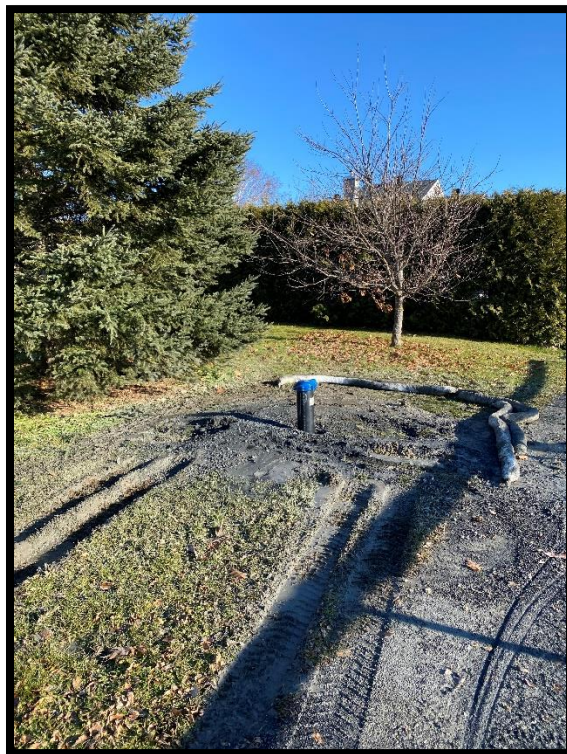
Lajoie St. Observation Well, Looking Southwest
